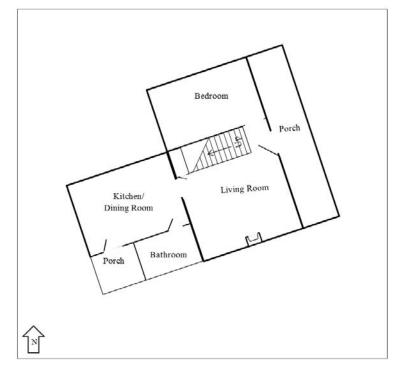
First Floor Plan of the Forbes House, Not Drawn To Scale.
